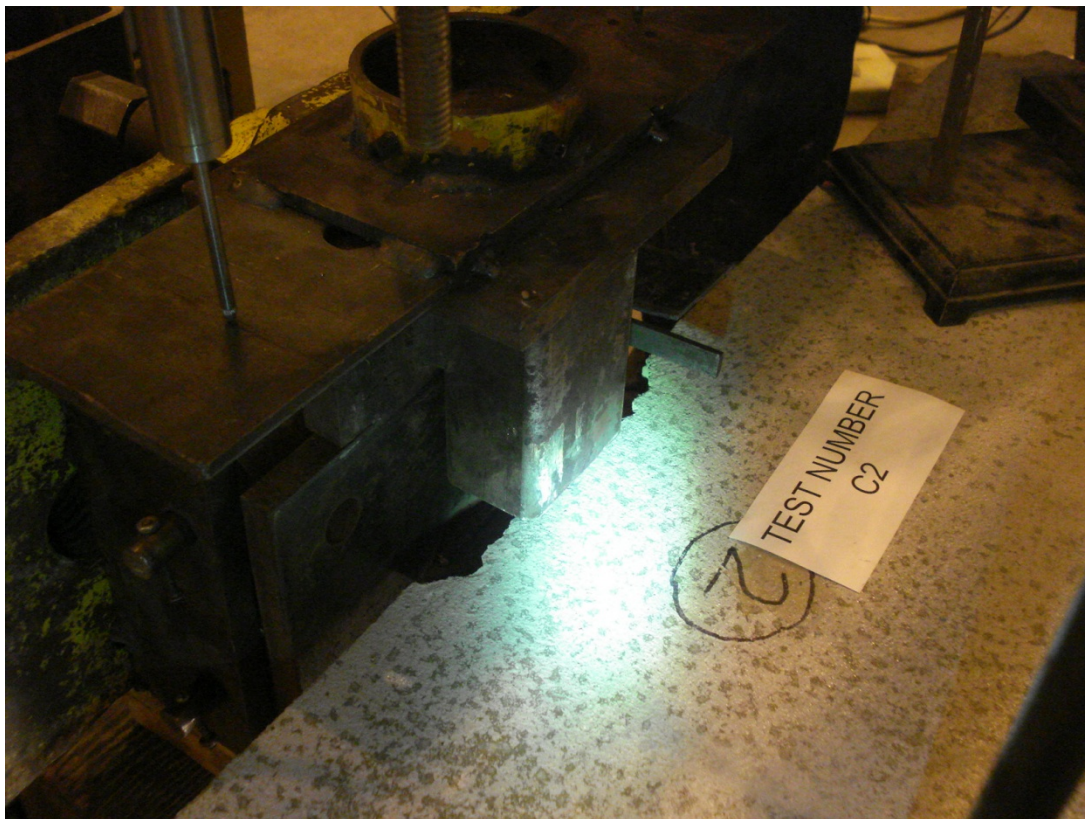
Test C2: Out of Plane Shear w/ No Tension
